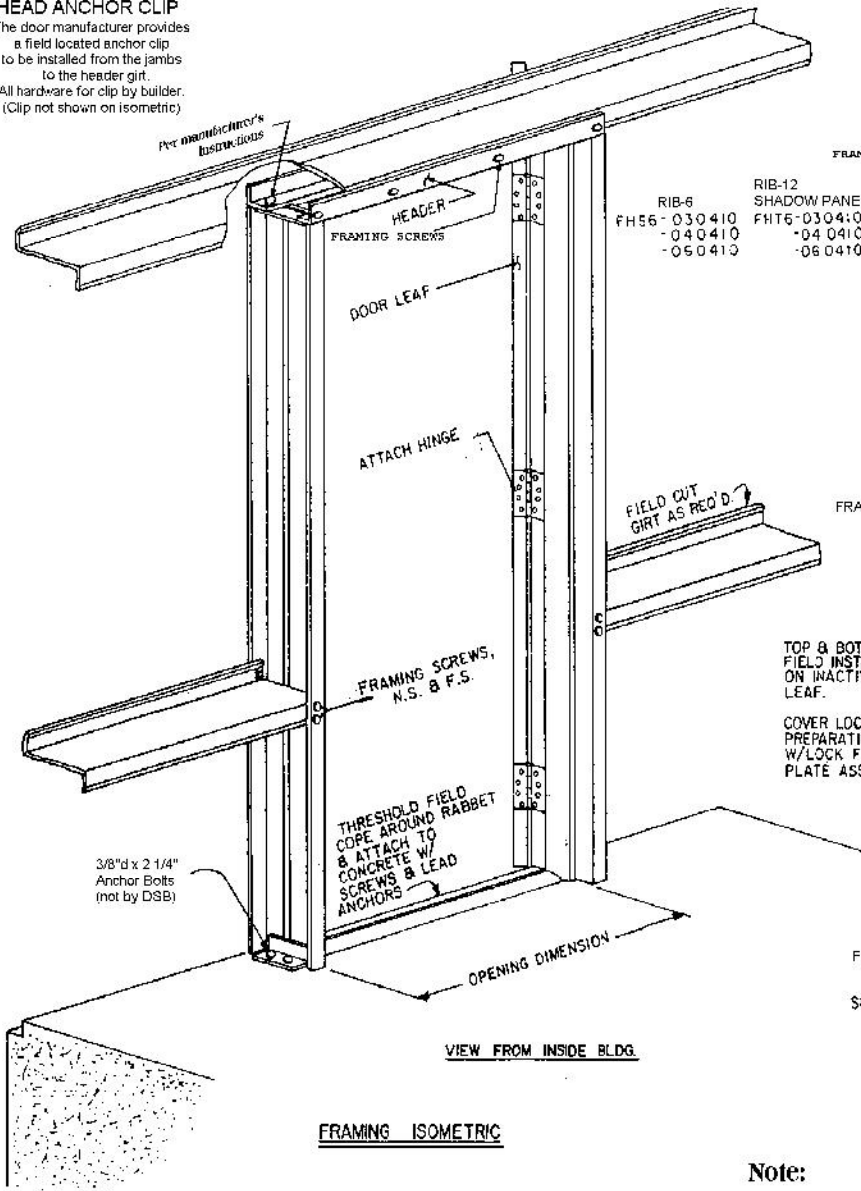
DETAILS NOT NOTED SAME AS SIDEWALL CONNECTION
